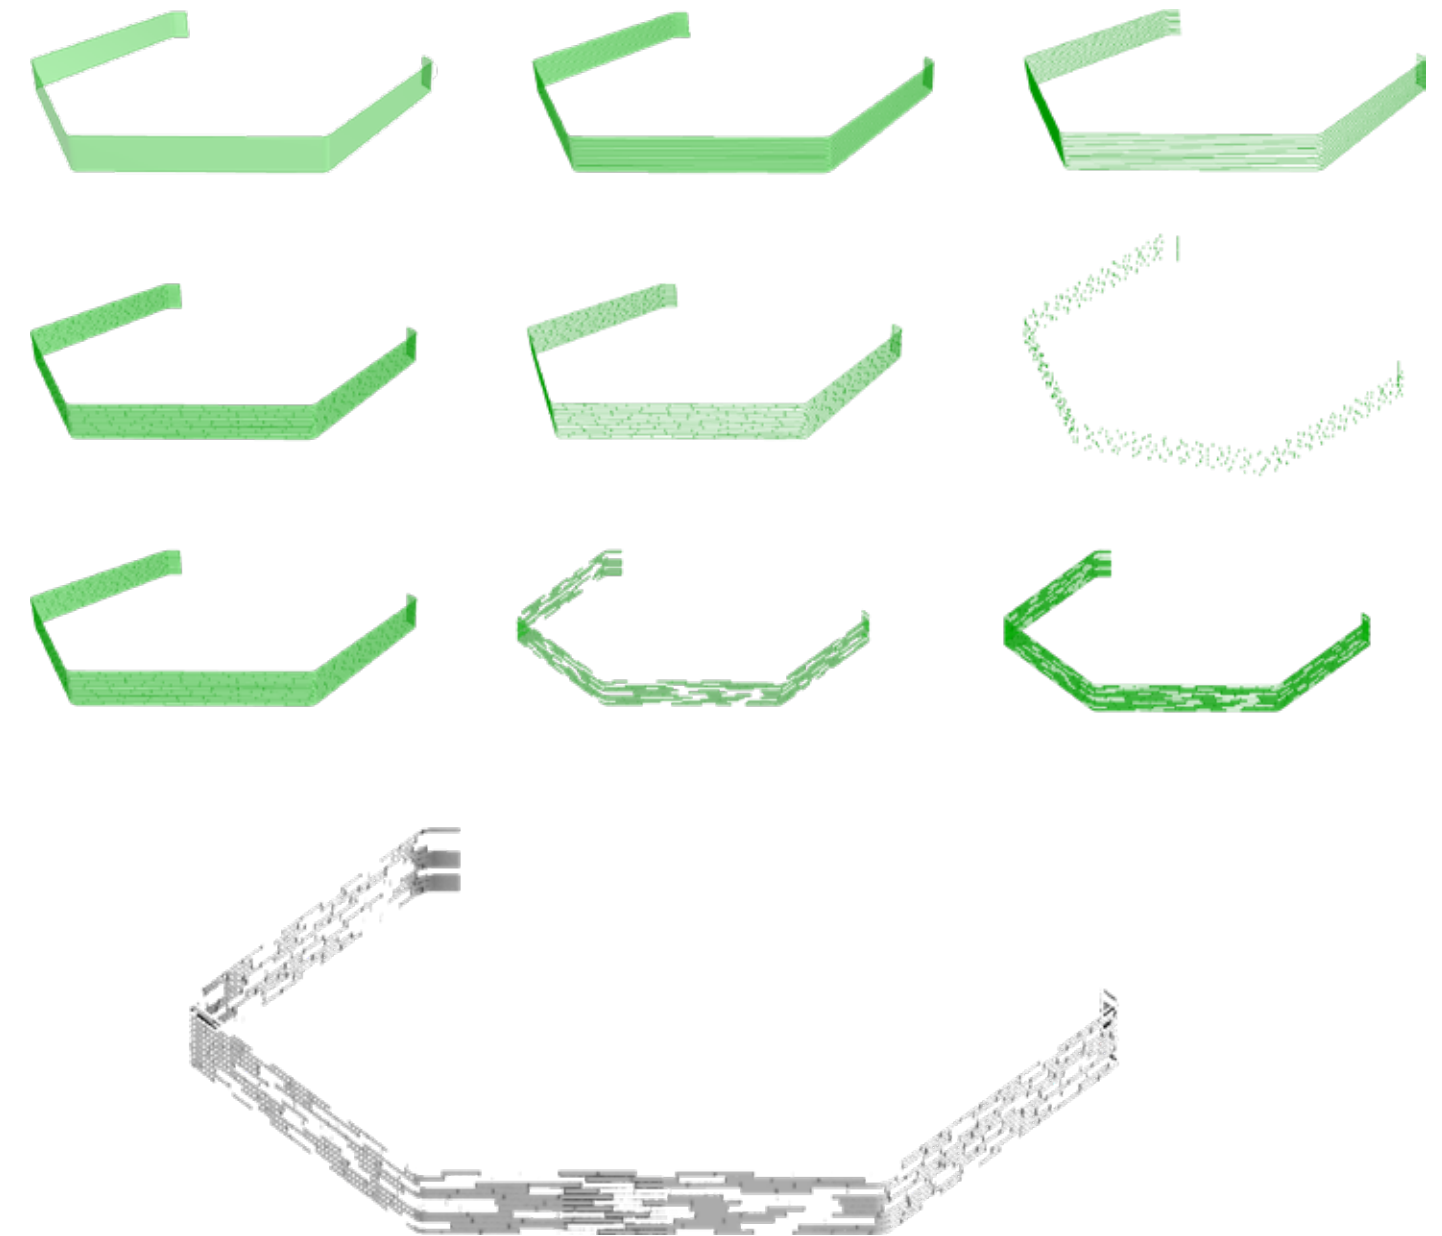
The strip panel facade system was executed in a similar way to the louvres on the walls inside the concert hall, by subdividing the surface into parallel structural lines. However, this system instead employed random distances and culling to create a mathematically unique facade. The panels were textured with a perforated material to avoid having to perforate the geometry beforehand, which would have created hundreds of thousands of extra faces and edges.
